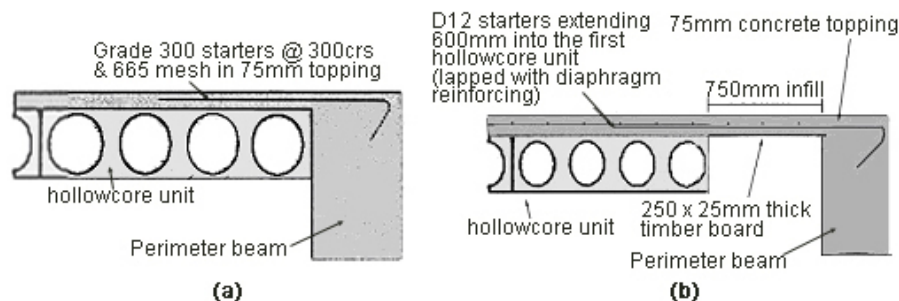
Modelled slab-side beam connections (a) “no-infill side connections” (b) “infill side connection” [5]
